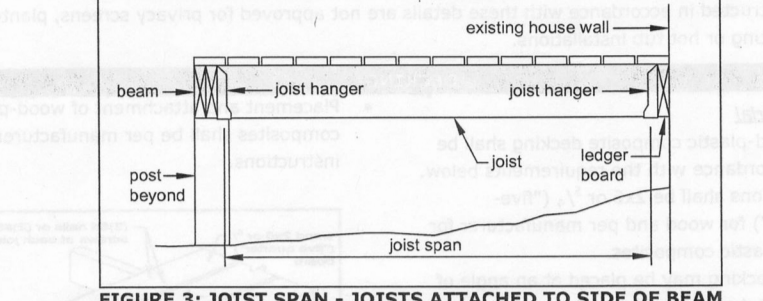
JOIST SPAN - JOISTS ATTACHED TO SIDE OF BEAM
